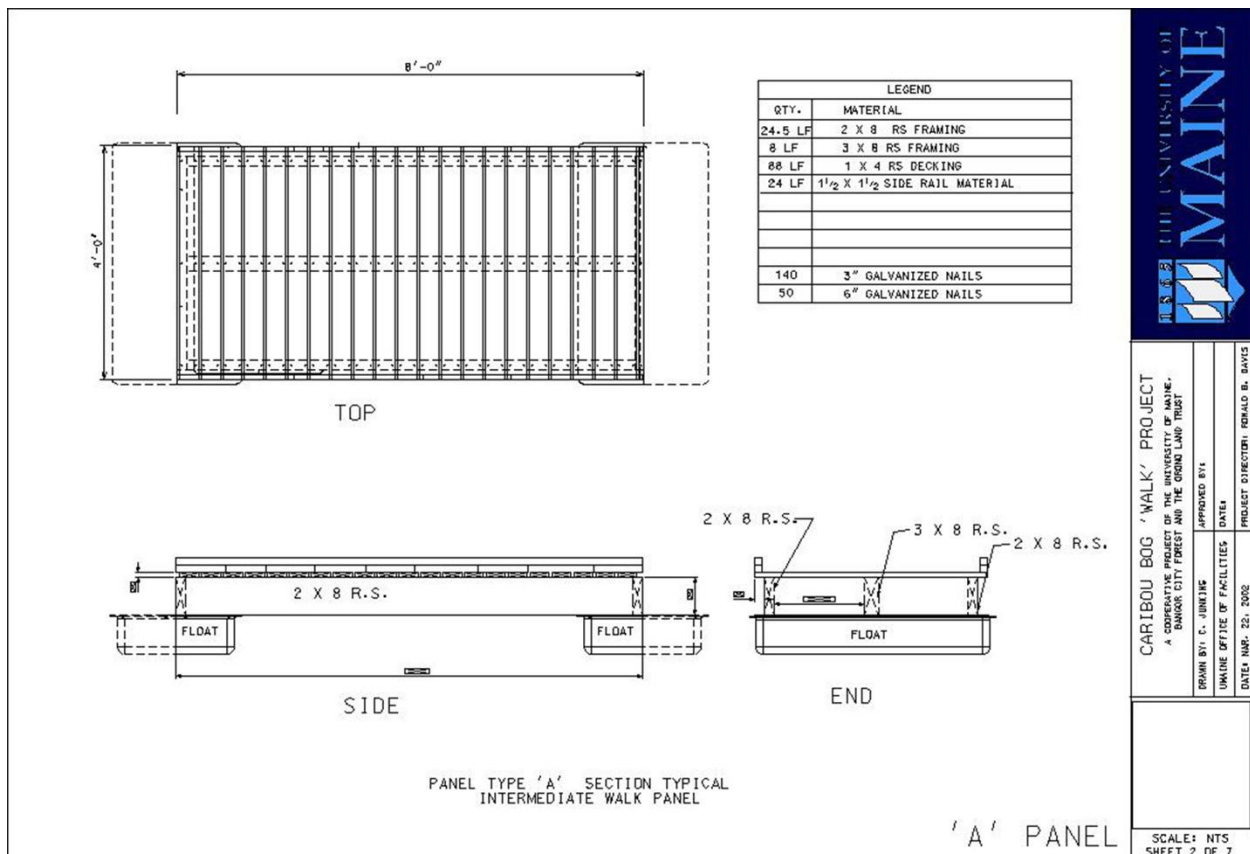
Digital technical plan drawings of a standard, 8 ft (2.44 m) long OBB section on floats by Claude A. Junkins of UM Engineering Support Services, based on by-hand technical plan drawings by Ronald B. Davis. When standard sections on floats abut one another, each section occupies only half a float.
